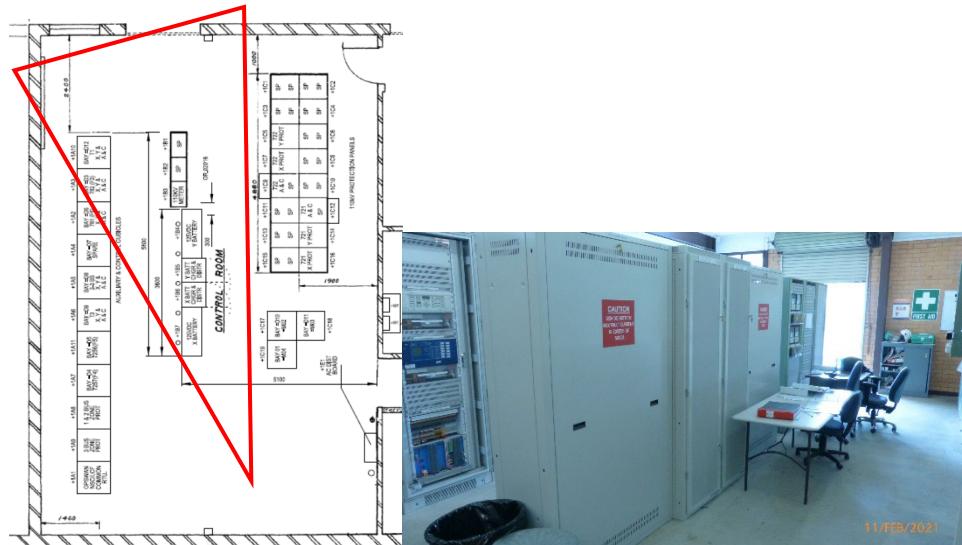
Substation Secondary Systems Building +1 Internal View 3.
